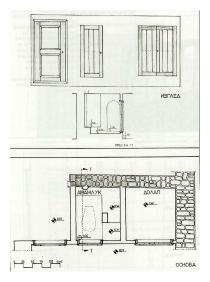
Elevation, section and plan of a bath unit (hamamdzik) incorporated into a cabinet– image from (Nikoljski Panevski, 2018)
